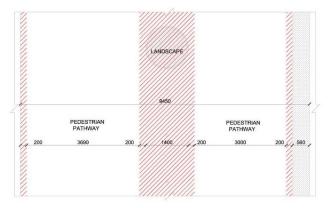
Street width and buffer spaces (in mm) for Gateway 10 in the area surrounding Offenbach am Main Hauptbahnhof
